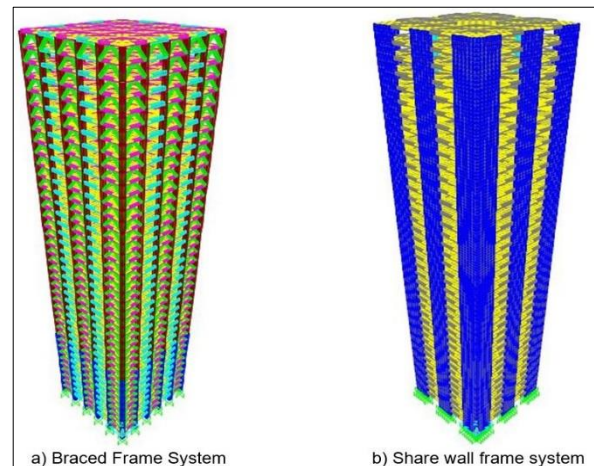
3D view of shear wall system and braced system model for 40-storey building model
